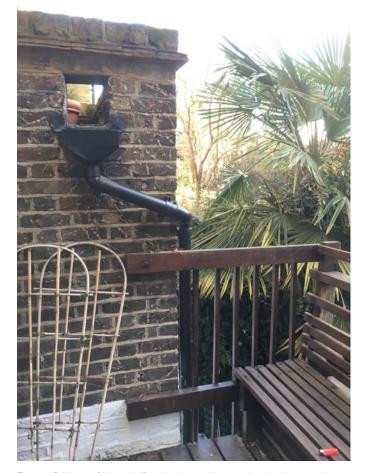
View of the interface between the existing balcony and original closet extension, poorly detailed.
